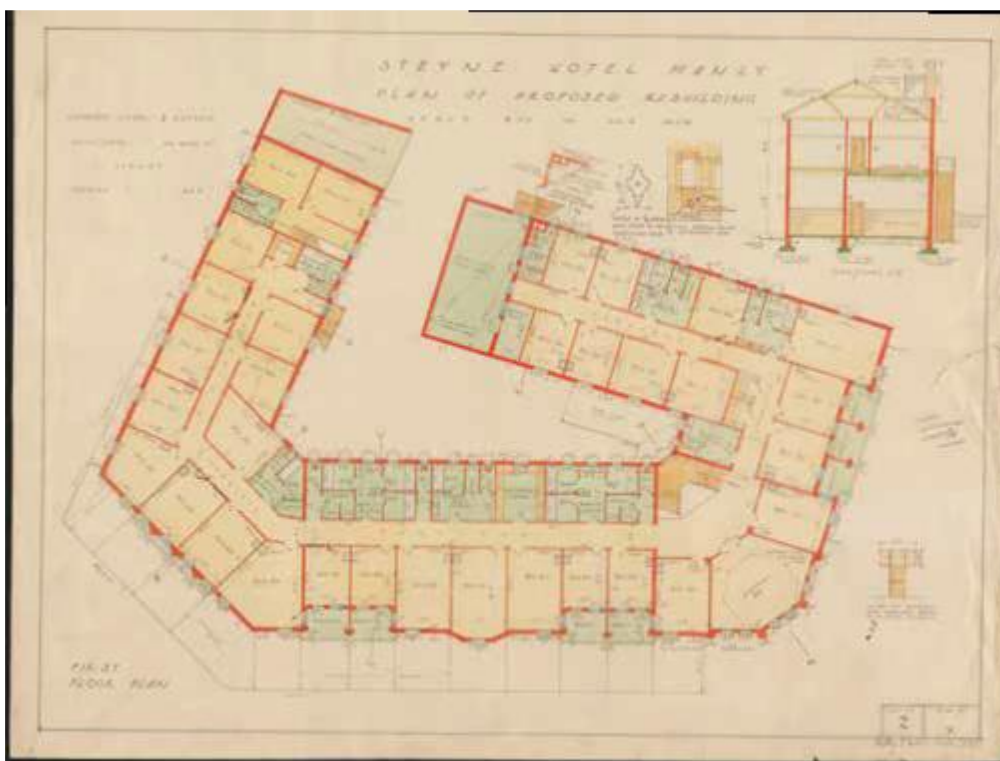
1935 Ground Floor Plan of Hotel Steyne (Source: Architectural Projects Pty Ltd (October 2019), 'Conservation Management Plan - Hotel Steyne', extracted from State Records (Id: 71111)).
